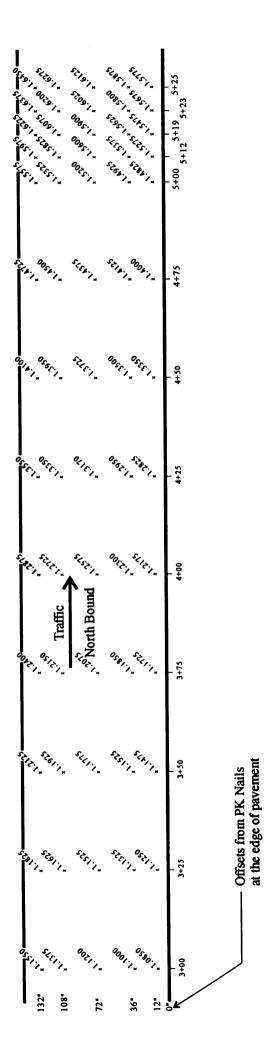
shows the locations of the installed instrumentation at the site. The instrumentation hole is at station 5+19 and the piezometer is at station 4+00. Figure 2 gives the plan view of the portion of test section 251002 that was used for elevation measurements. All offsets are from the PK nails found at the outside pavement edge.
